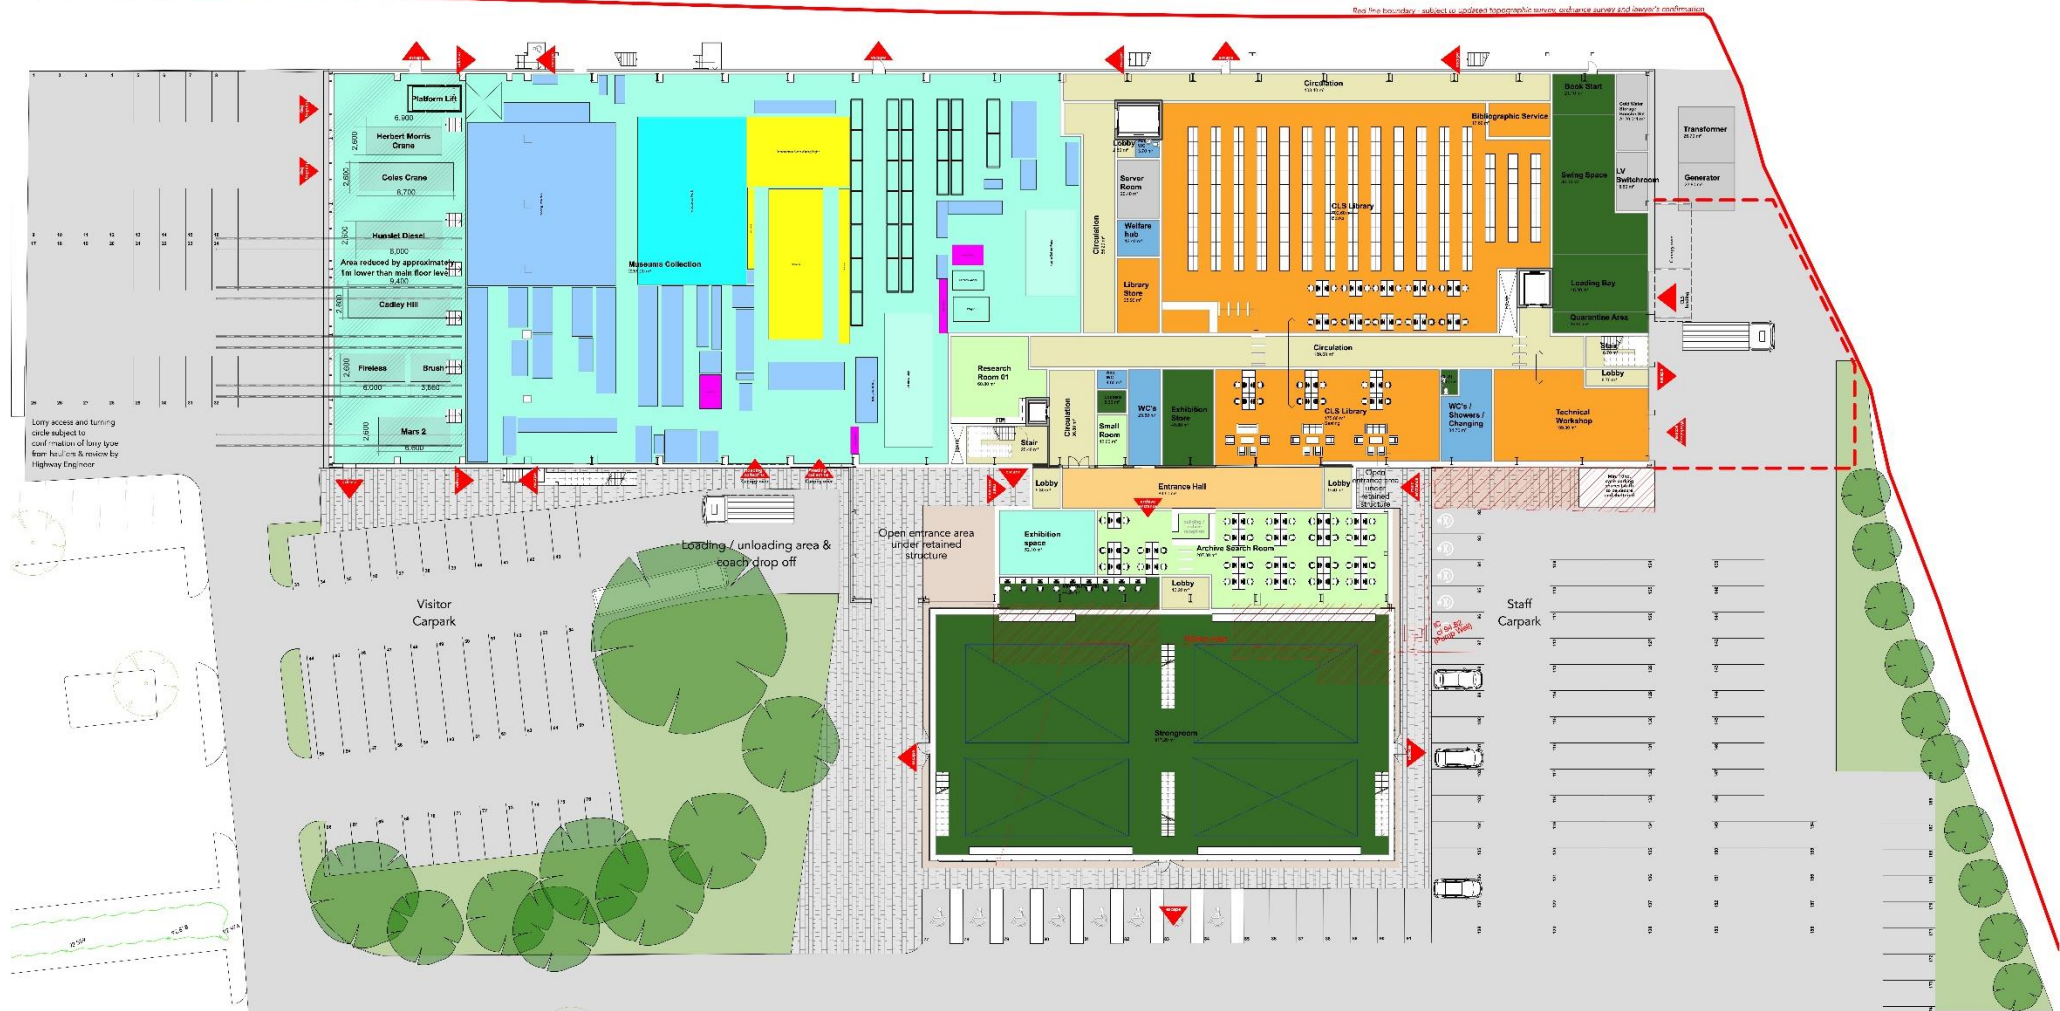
Proposed Archive, Collections and Learning Centre – First Floor design layout showing spatial allocations and adjacencies
